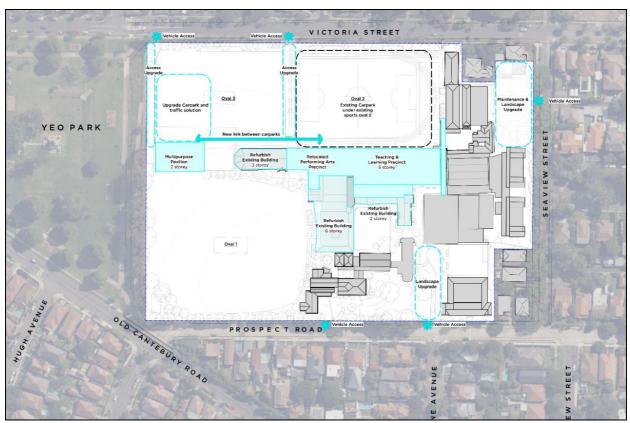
Proposed Site Plan (Source: PMDL, 2020)
